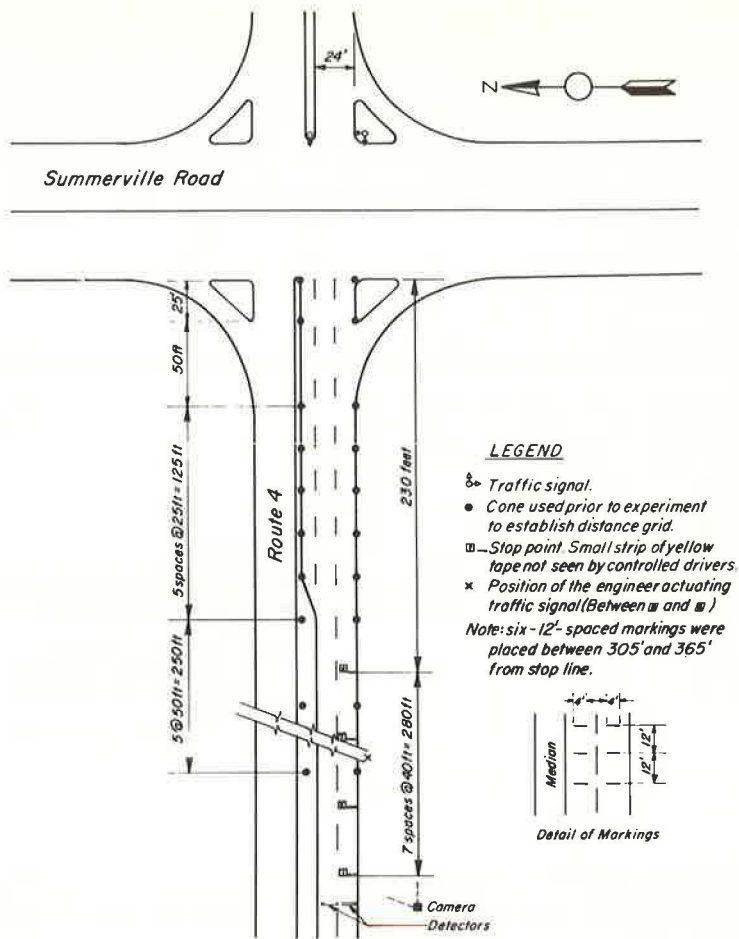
Rural intersection: Route 4 at Summerville Rd., experiment layout.
